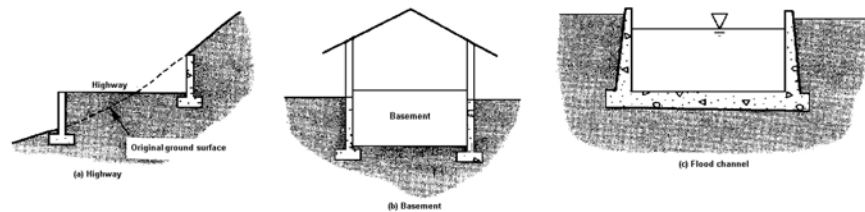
Typical Application Of Retaining Structures. (Huat et al, 2006)
